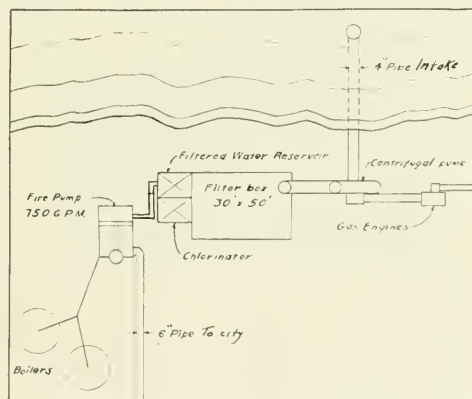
PLAN OF A TYPICAL FILTRATION UNIT
